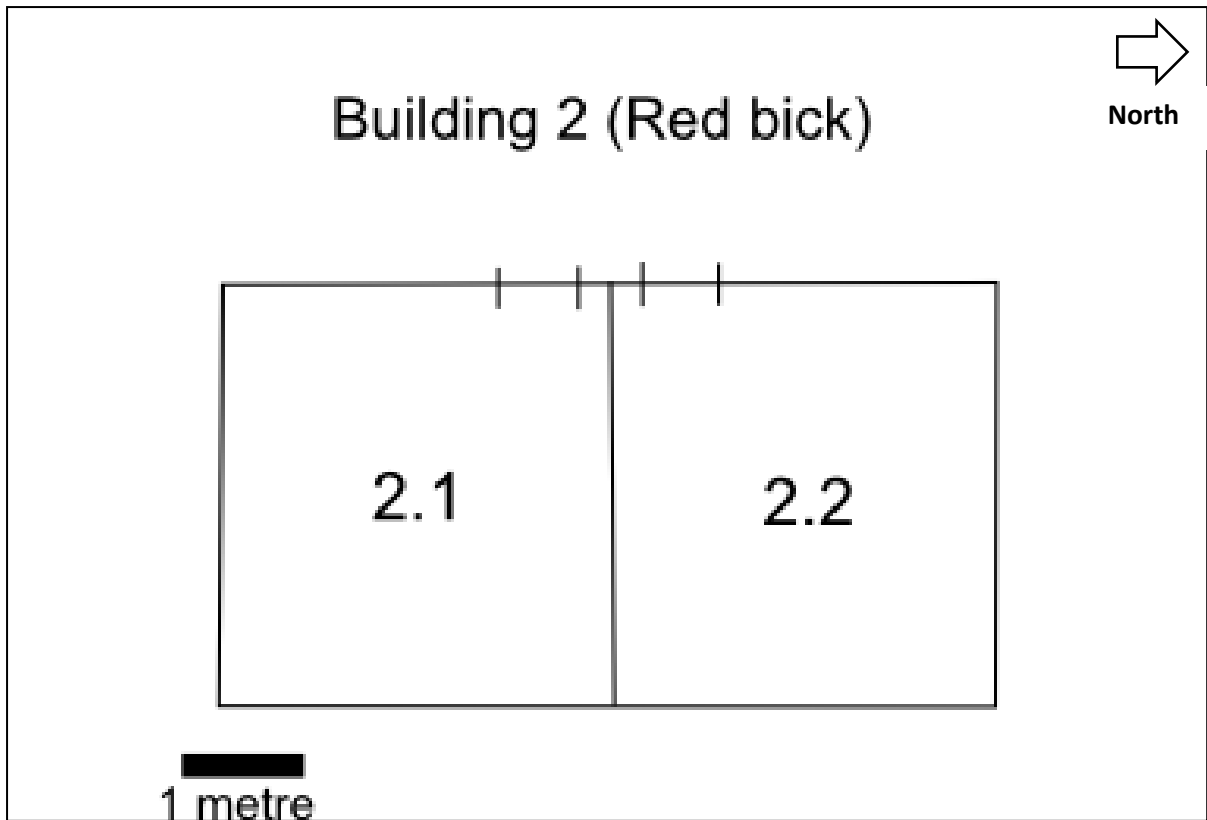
Sketch of Building 2 and both its rooms and entryways.
